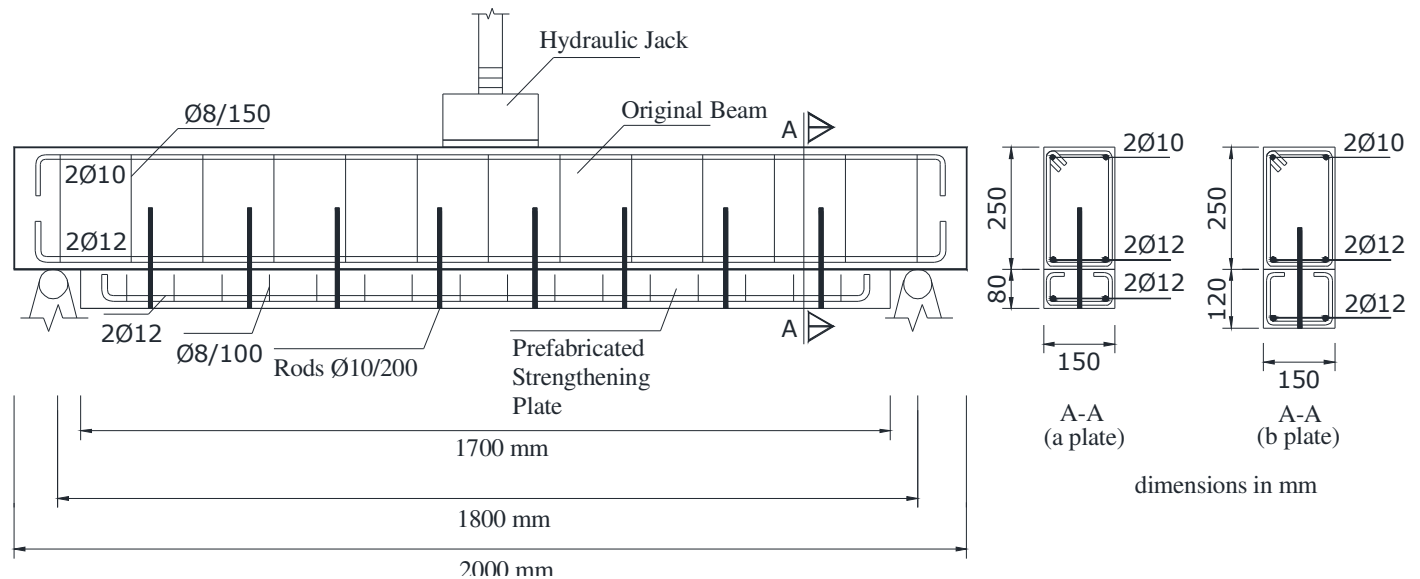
The strengthening with “a and b” plates of the first type beams named “A”.
